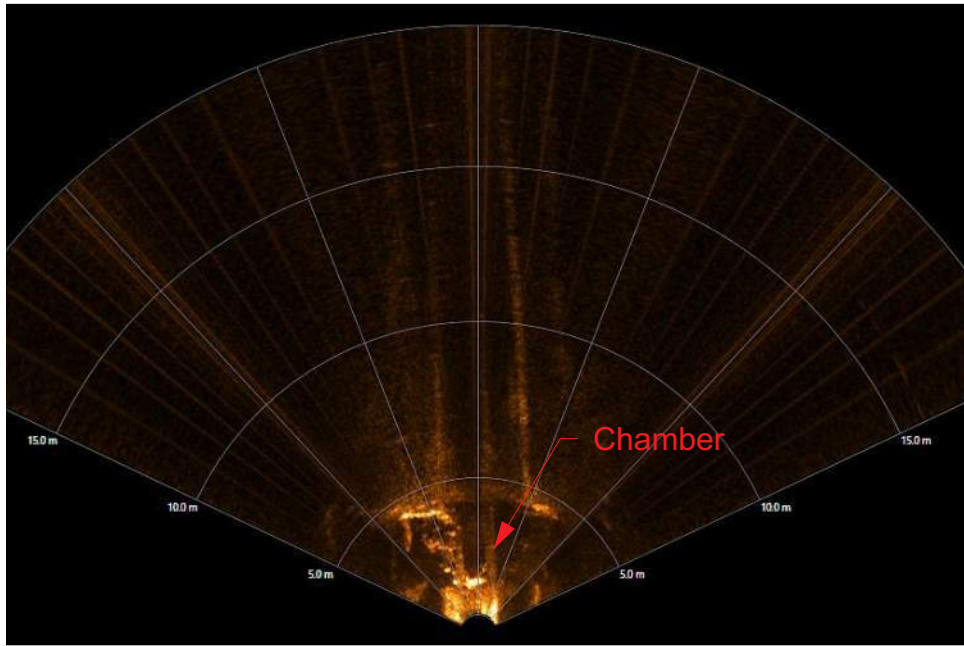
Sonar image at 39 feet downstream of Access Point 1. Chamber for manhole access 3 feet ahead.
